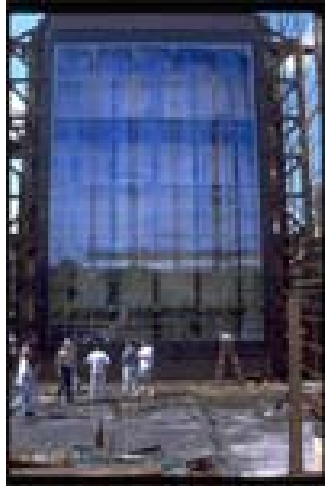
UBS Tower cable net facade; a full scale mockup prepared for testing (ASIDI).
